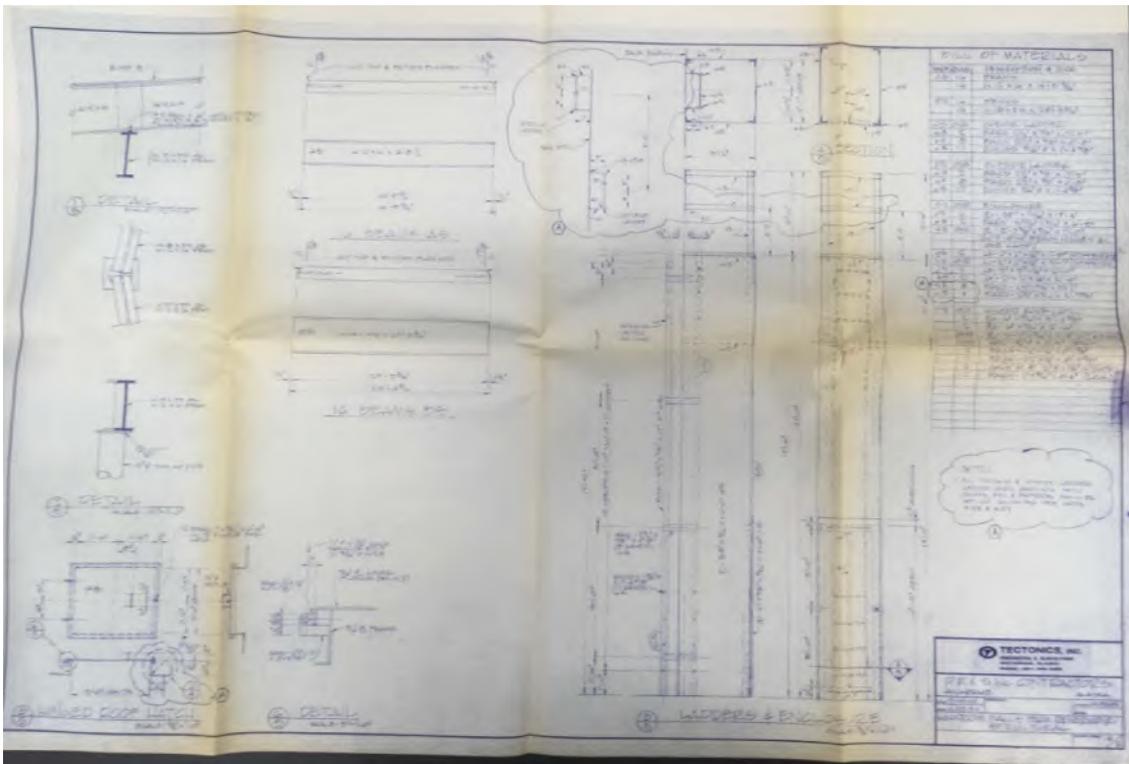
Whatcom Falls 1 – Ladder and Hatch Details
